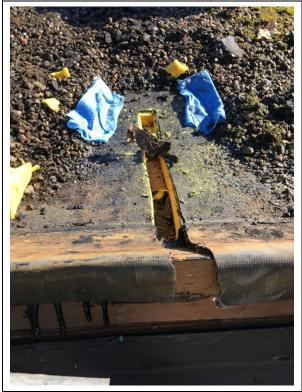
East Roof (N) - West End Roof Test Cut [7311-A02]
